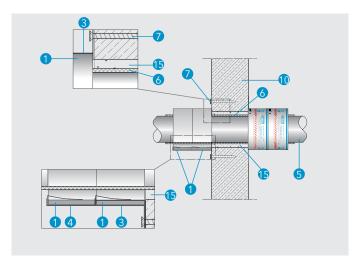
Detail C - PROMASTOP®-FC MD penetration seal in flexible wall for pipes without insulation (Ø > 125 mm)
